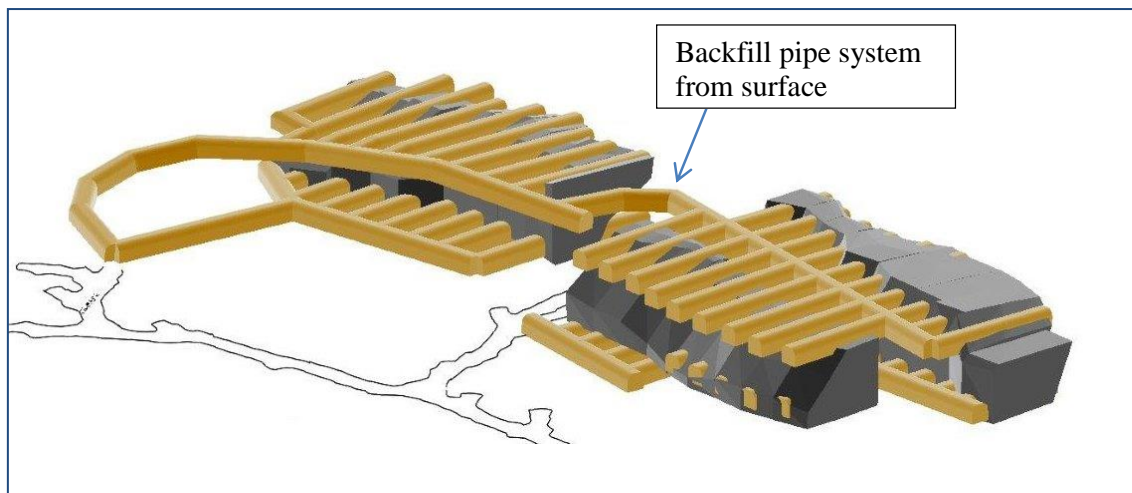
DEVELOPMENT OF FOOTWALL AND HANGINGWALL DRIFTS IN THE CROWN PILLAR. DRIFT SHOWN AS THIN BLACK LINES IS ALREADY DEVELOPED.
